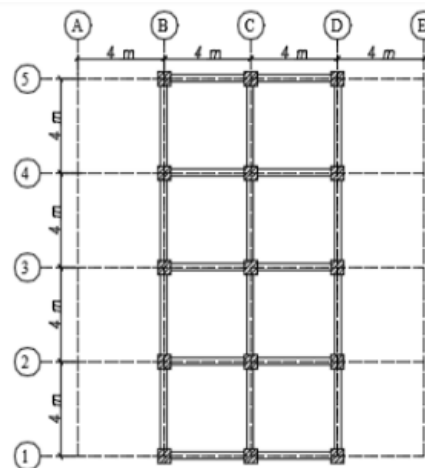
Plans of Models C and D (for floors from 8 to 13)
